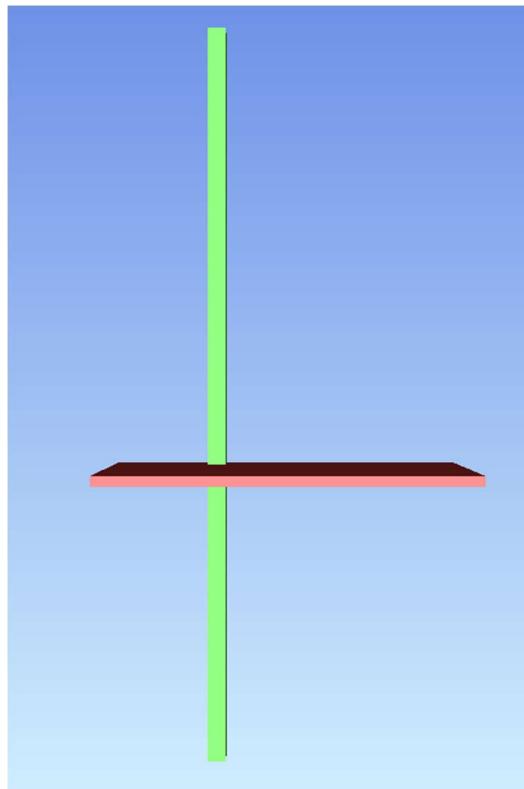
High Clash of Architectural wall (Element ID 2193) vs Structural beam (Element ID 166402) - Bottom Side View
